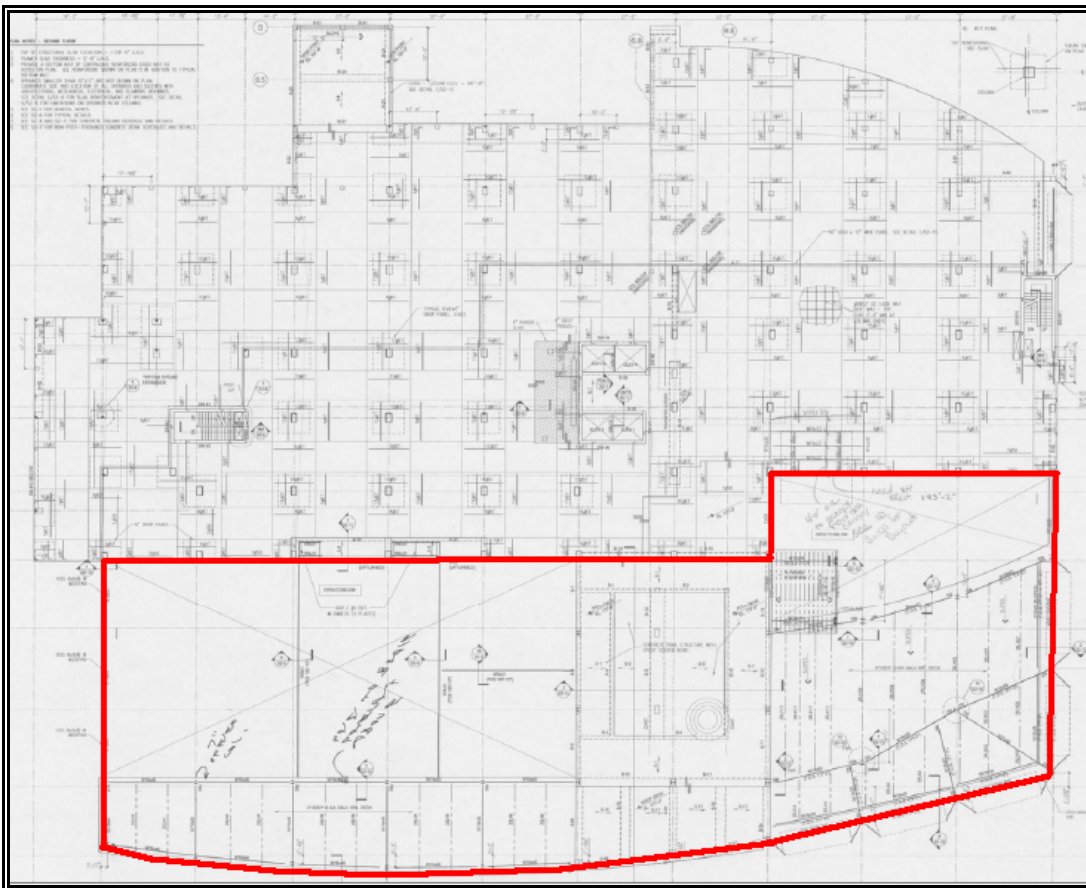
2nd Floor plan with highlighted “Adjacent Structure”
